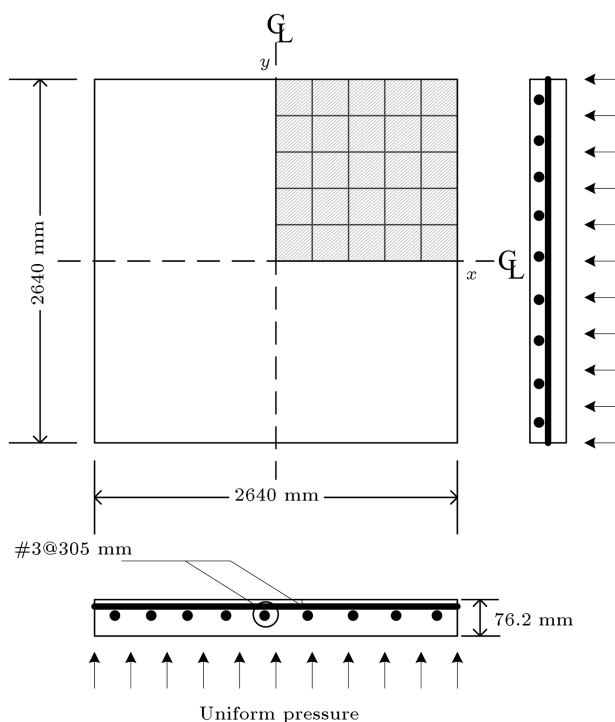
Detail of Mosallam-Mosalam specimens for reinforced concrete slab.
